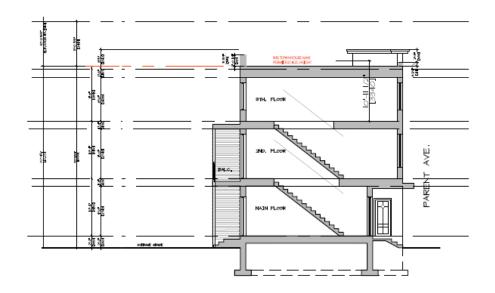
Section through the building. Source: Hamel Design August 2019 Rev. 18
